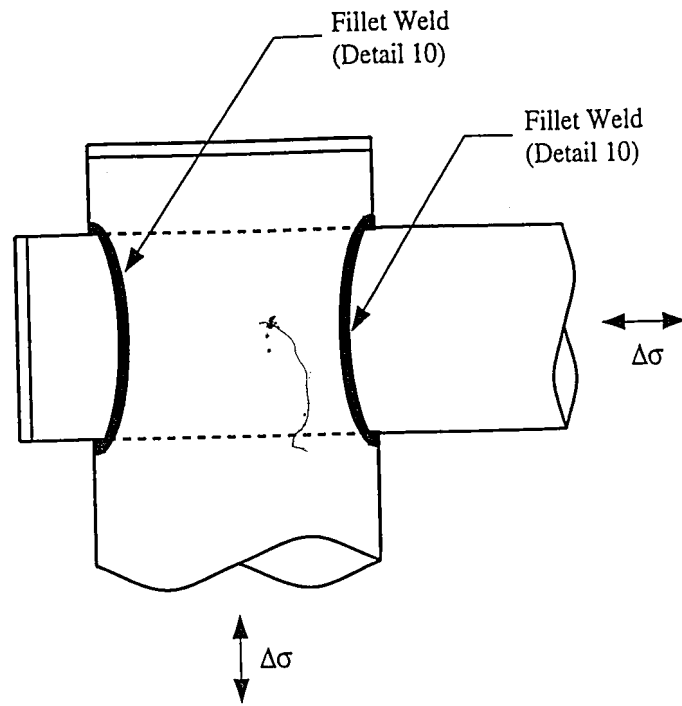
Fillet-Welded Tube-to-Tube Column Pass-Through Connection.
